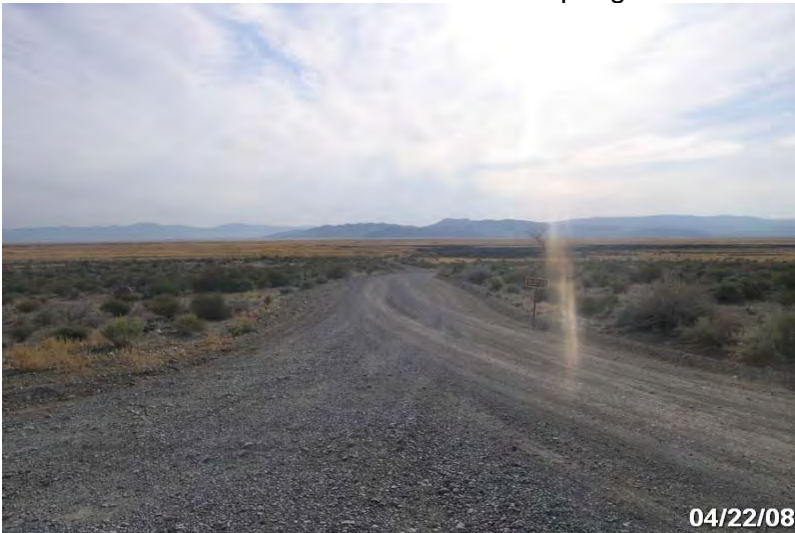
MP 0.57 - Begin Route at Begin Section
